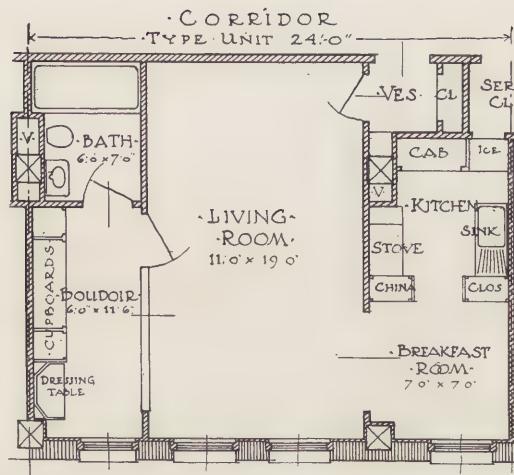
"TYPE UNIT" ON WHICH PLAN OF HOTEL SOMERSET, CHICAGO, IS BUILT UP.
